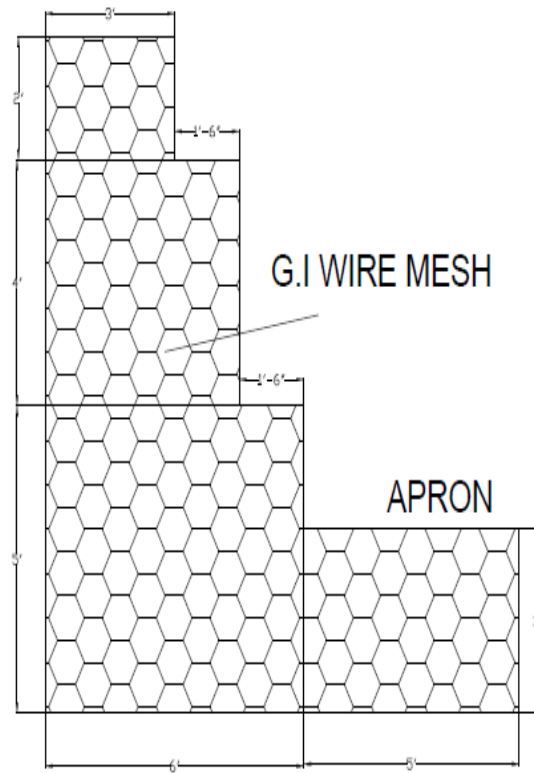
Layout of proposed floodwalls (gabion) for channel protection
